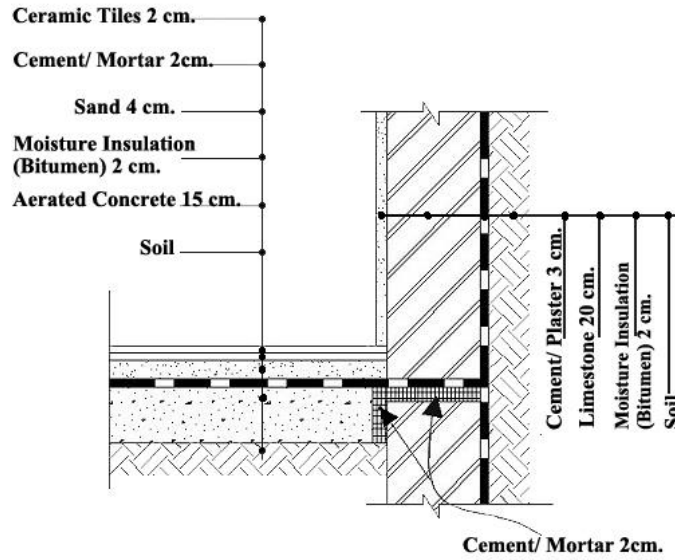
Cross-section of the calibrated basement floor and slab layers
